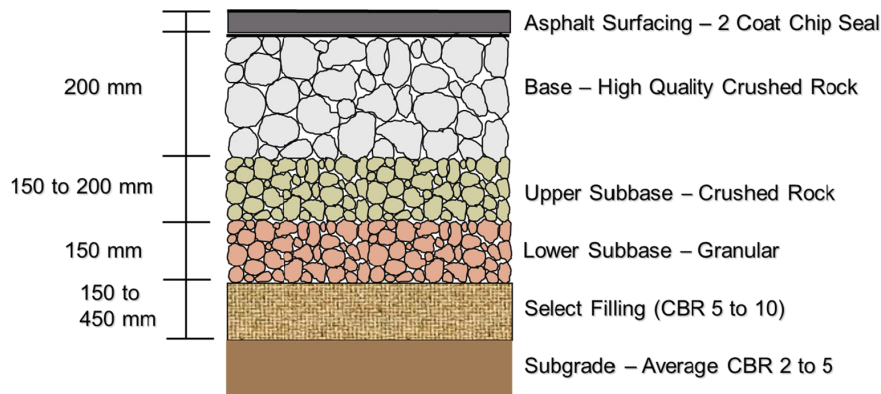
Typical heavy-duty pavement configuration in Australia (Beatty et al. 2002).
